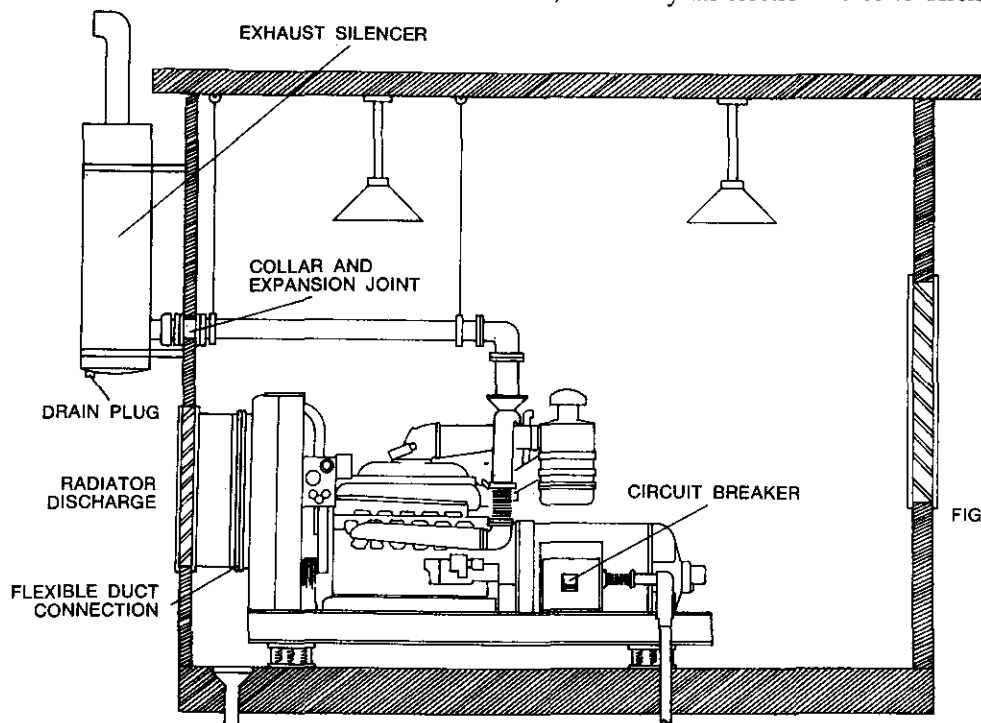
TYPICAL INSTALLATION WITH OUTSIDE VERTICALLY MOUNTED EXHAUST SILENCER
